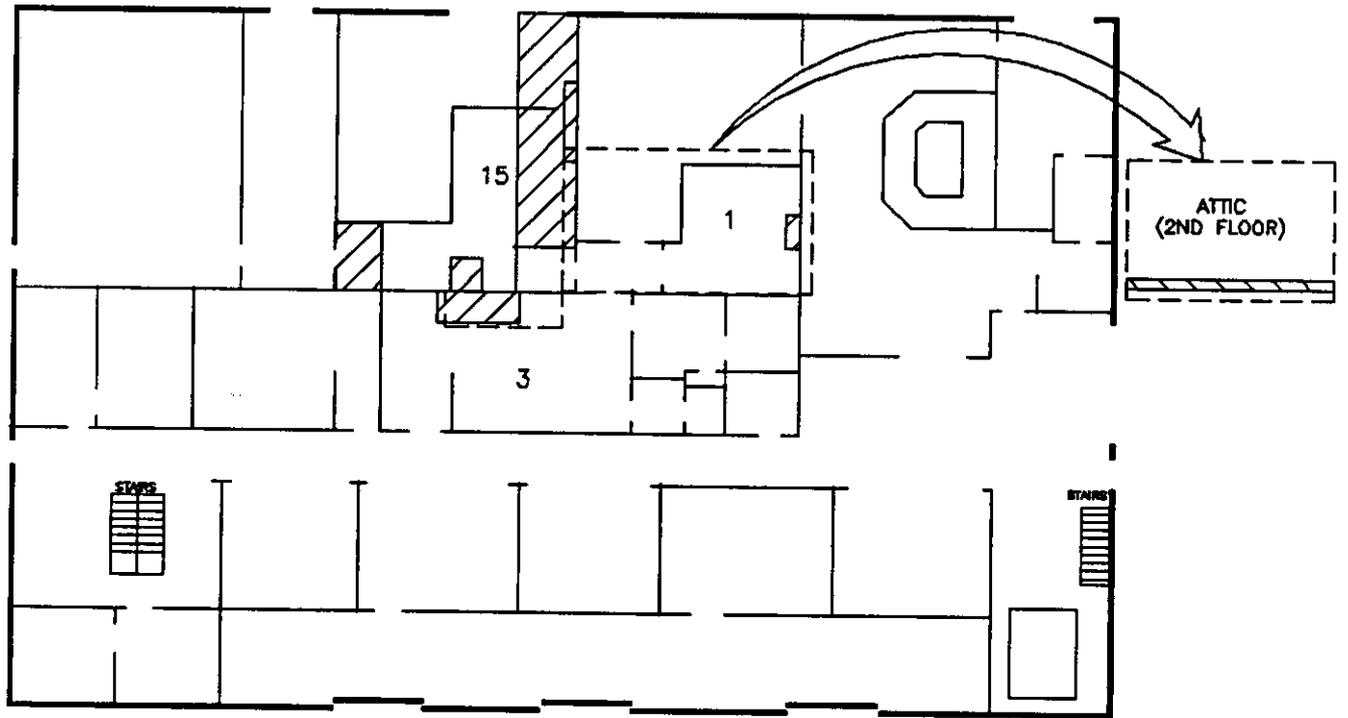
Building 24, Mezzanine, Indicating Measurement Locations in the Northwest Corner of the North Wall
